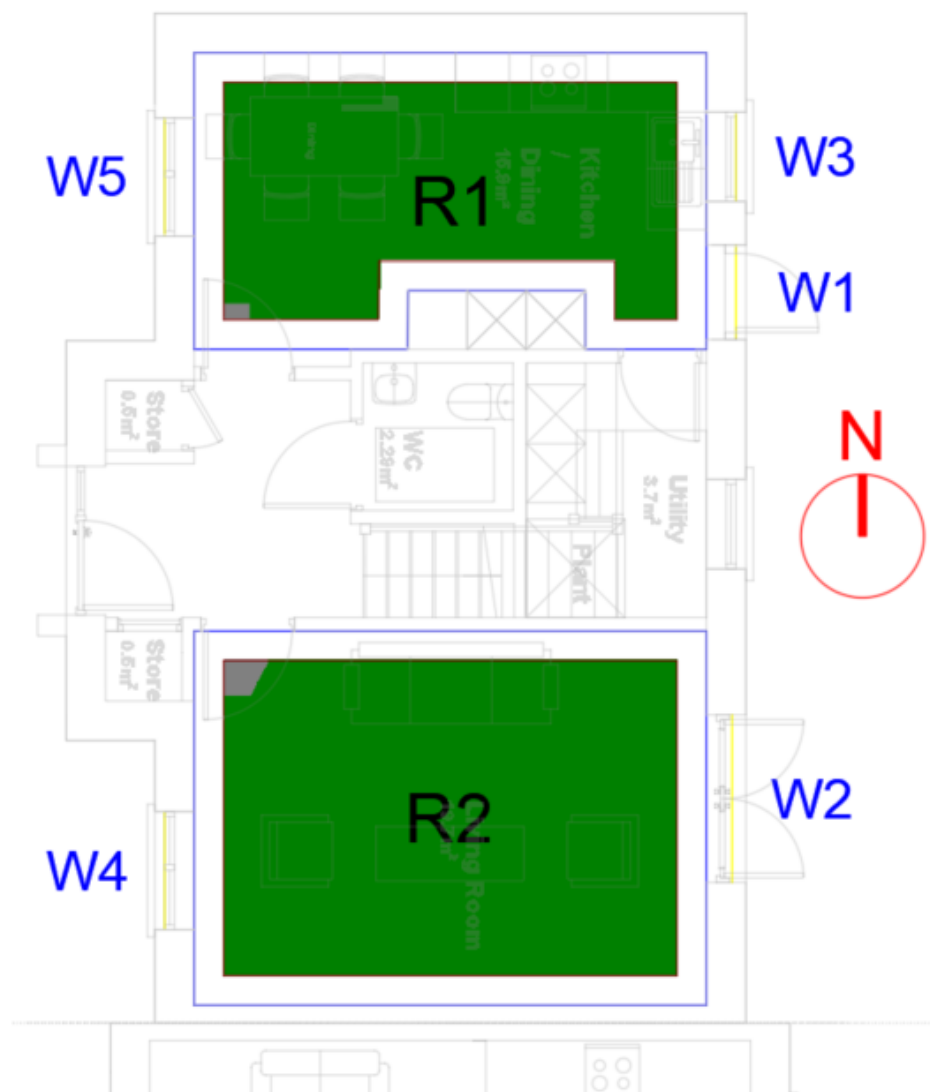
Proposed Ground Floor sDA Contours of House F-02 2-037
